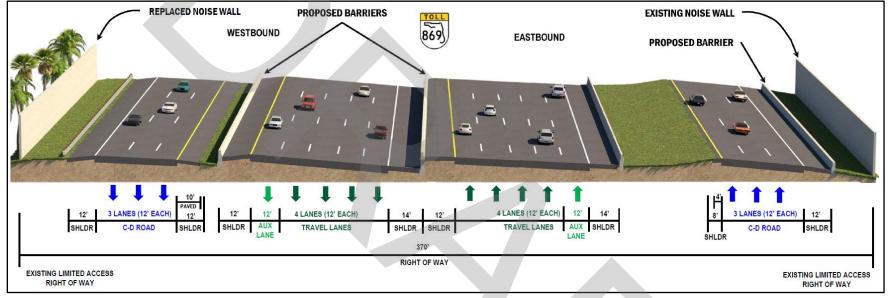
Preferred Alternative Roadway Section between Lyons Road and Florida's Turnpike
